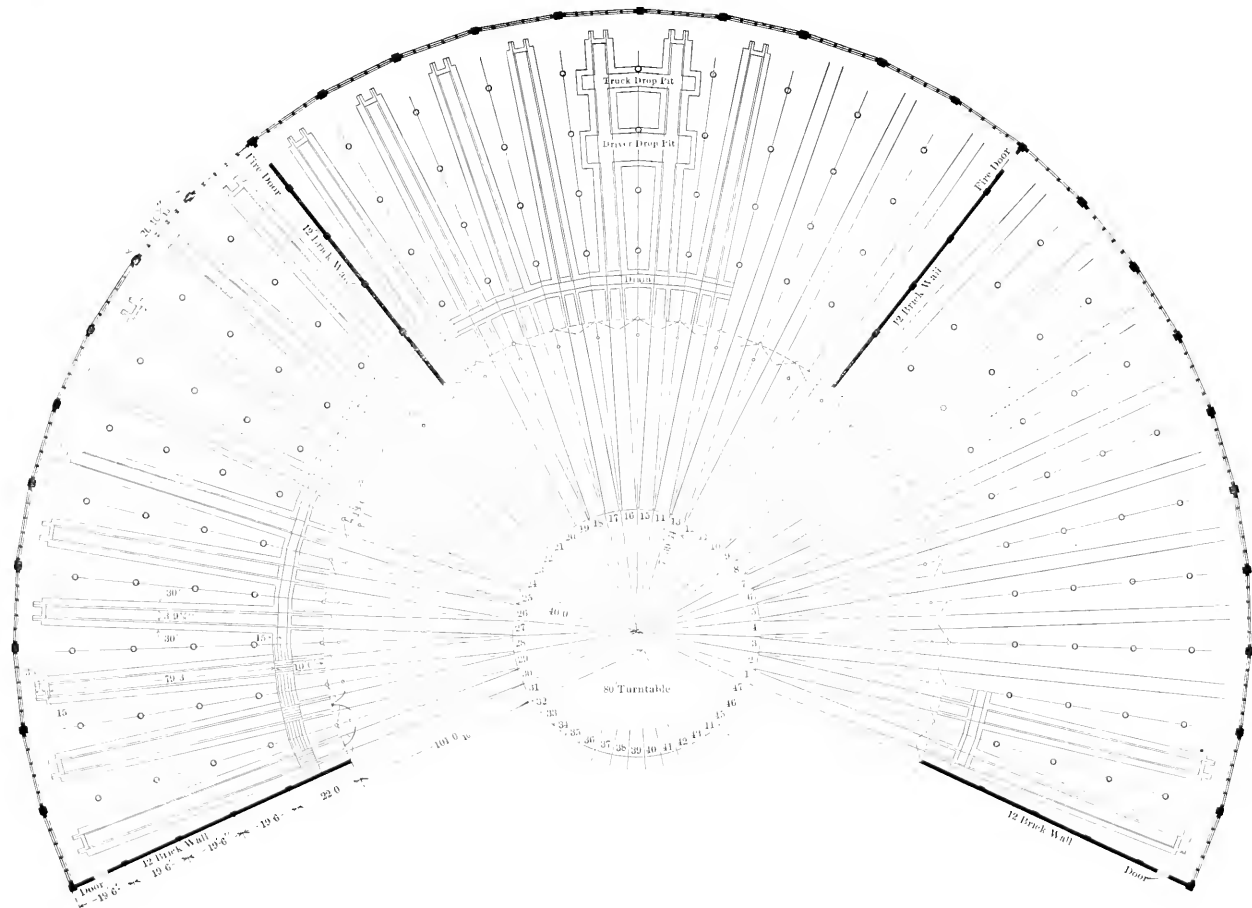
PLAN OF ENGINE HOUSE WITH 30 STALLS AND PROVISION TO CONTAIN 47 STALLS
